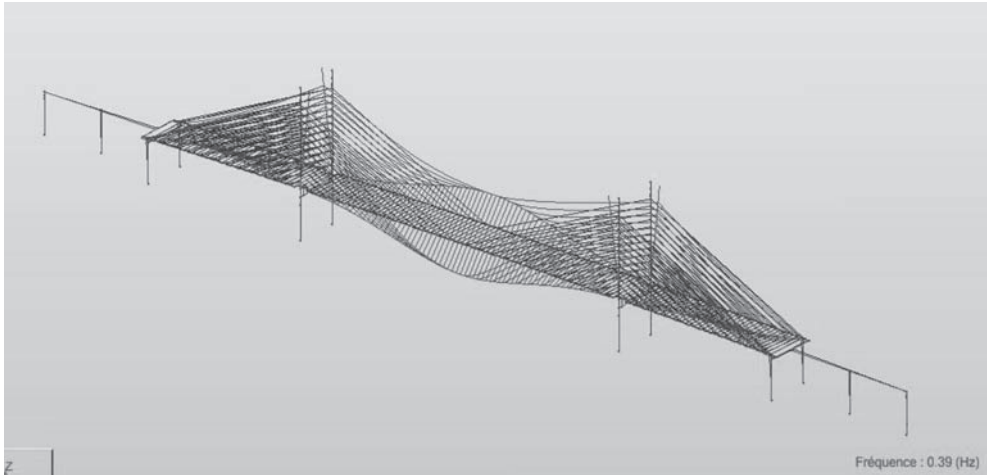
Reassessment of Penang Bridge behaviour under seismic load.
